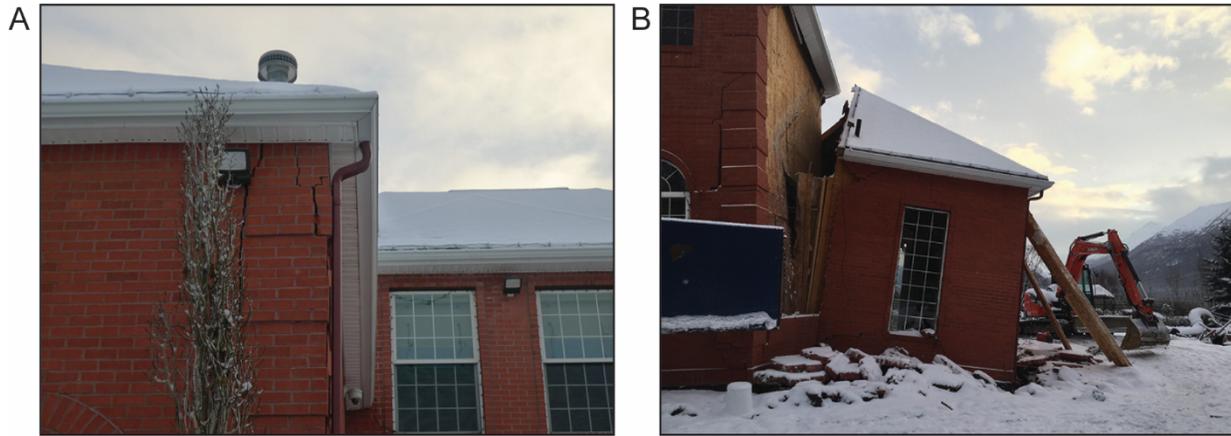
Damage to residence in the Ptarmagin Drive area of Eagle River (Lat/Long: 61.3049, -149.4958). Extensive facade cracking (A) and fill failure related tilting of a room associated with complete facade brick failure (B).
